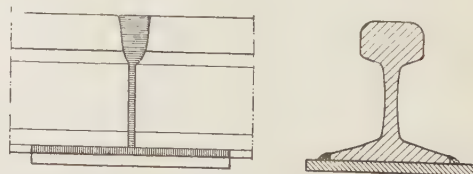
Electric-arc welded joint. (*Czechoslovak State.*)
